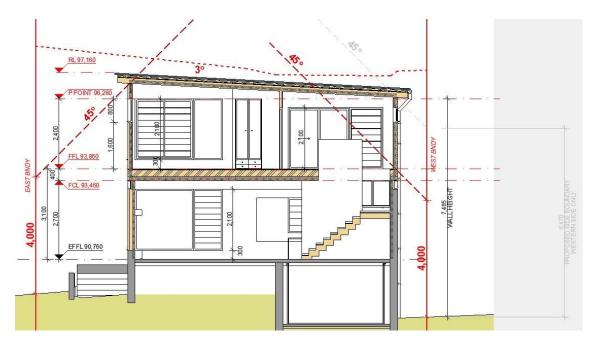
Cross Section S3: Encroachment to Western Side Boundary Envelope
